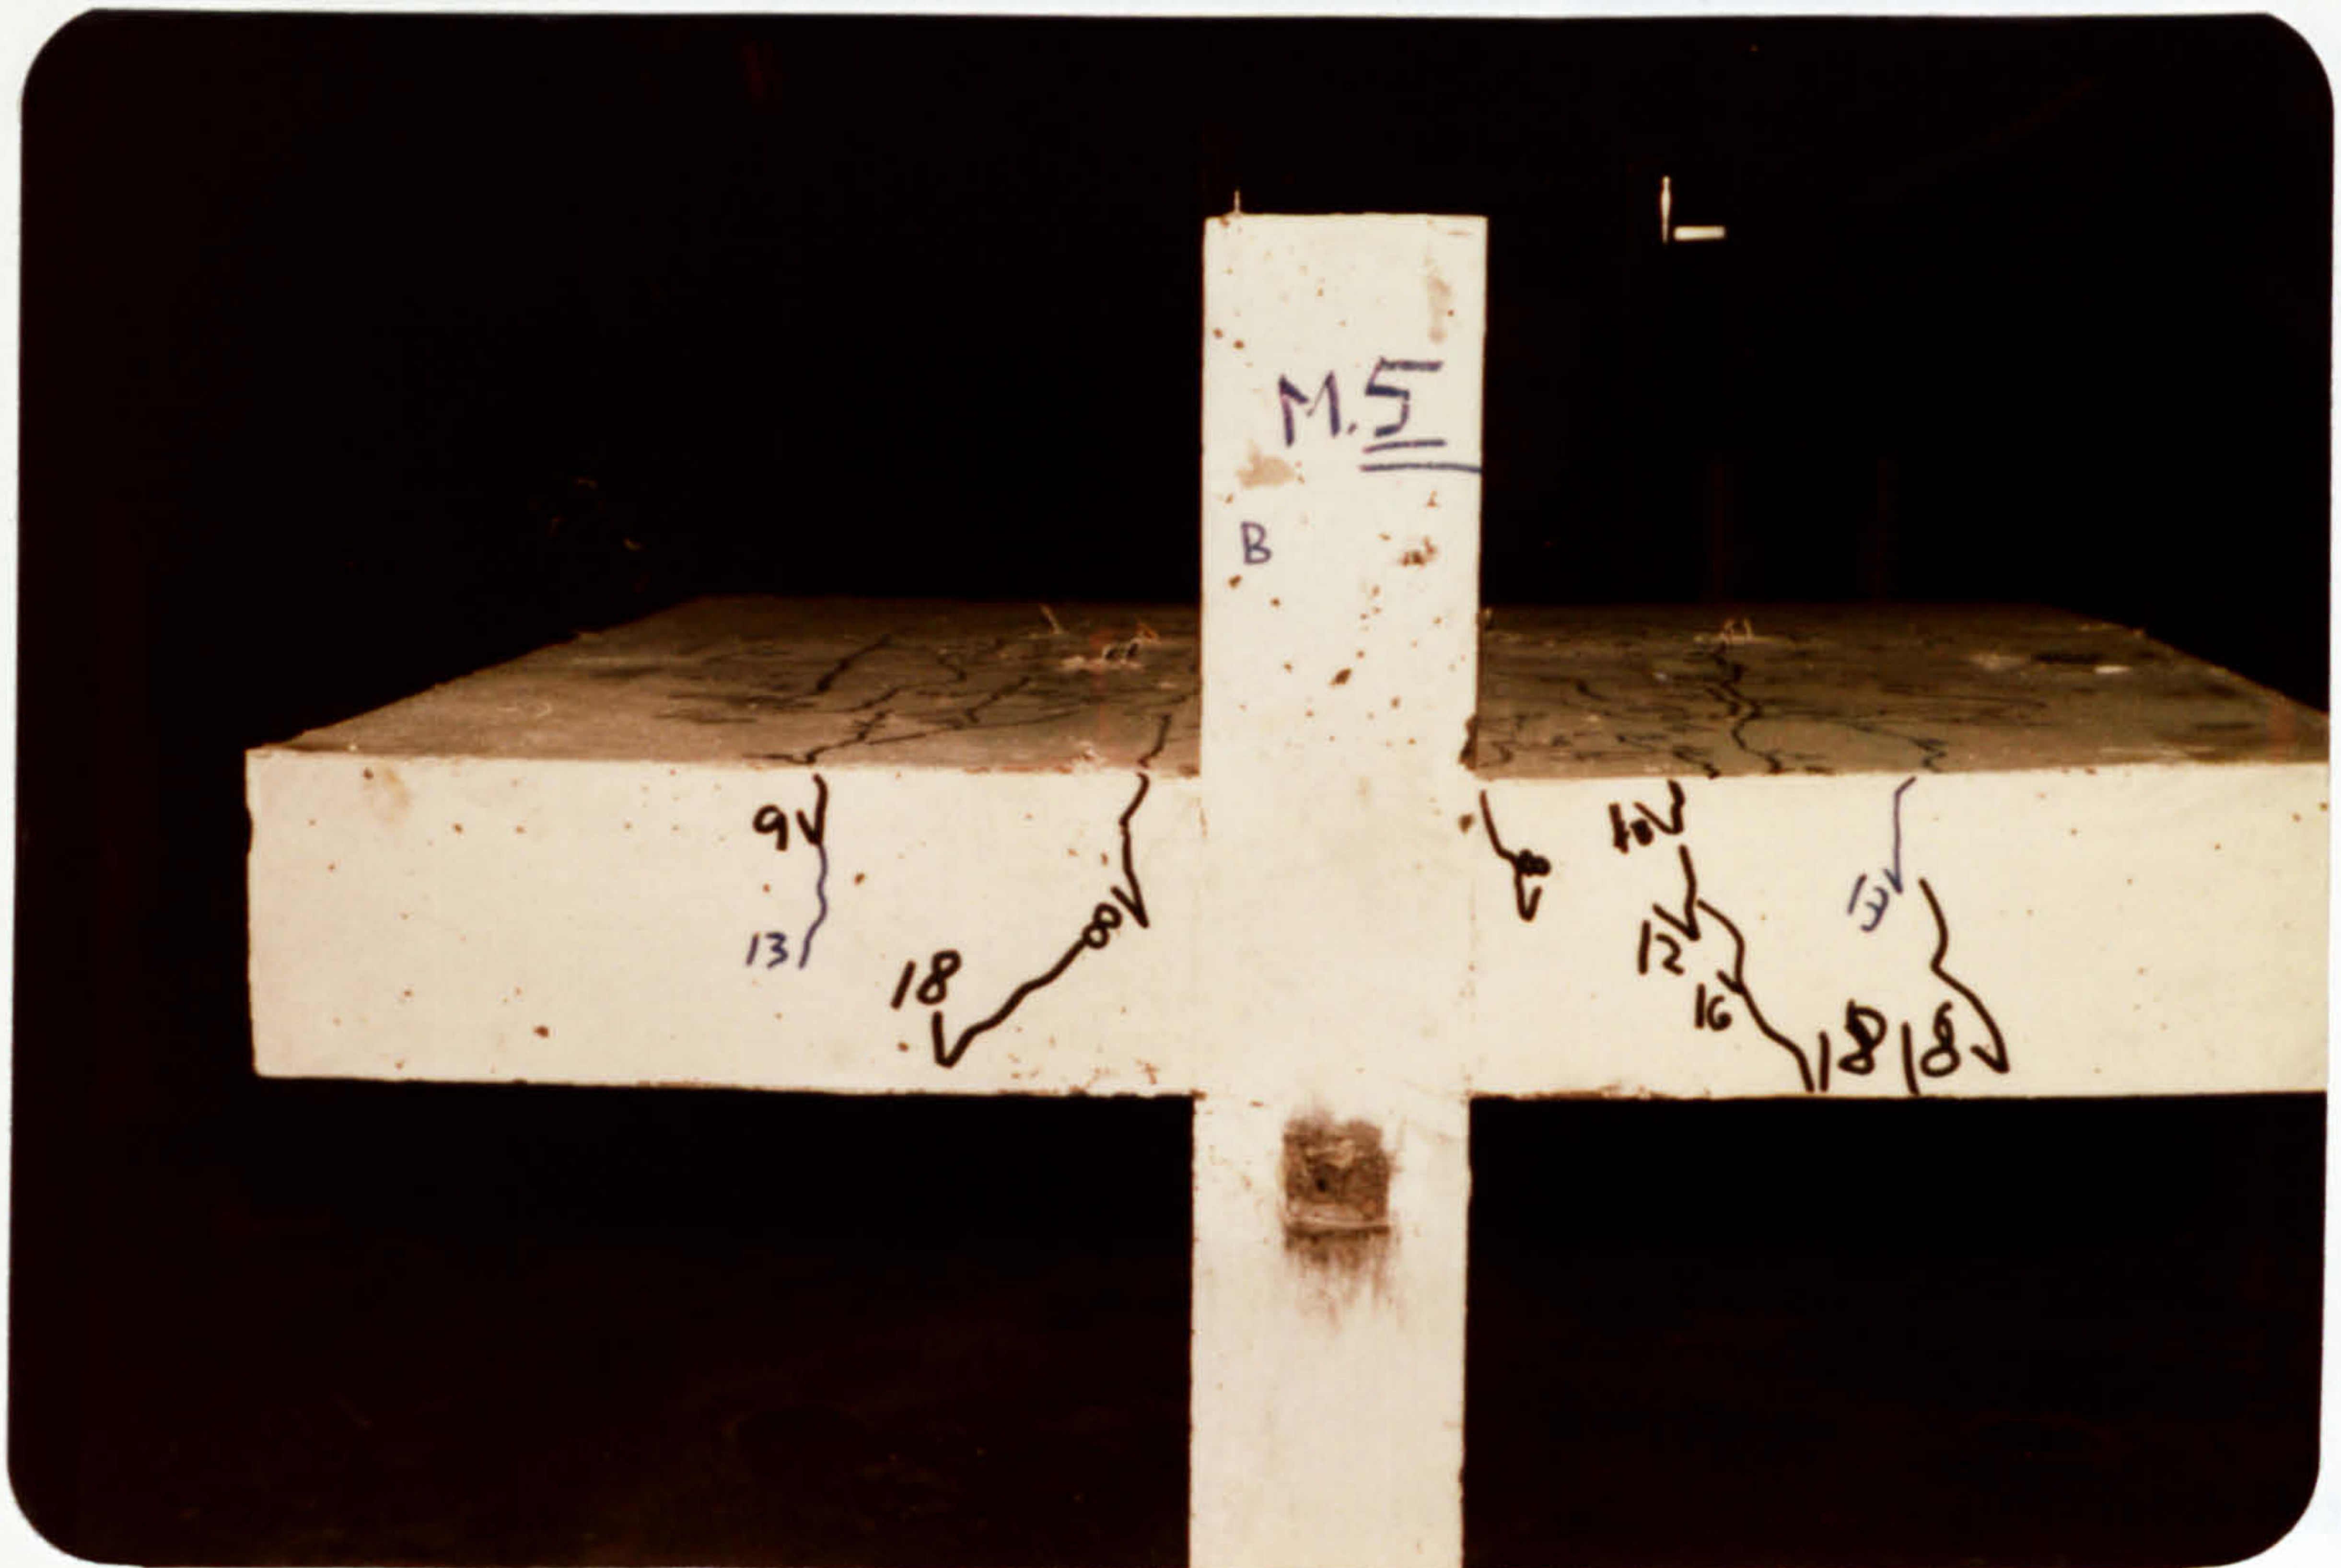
Photograph showing shear cracks in the slab at the back of MT5 after failure.
